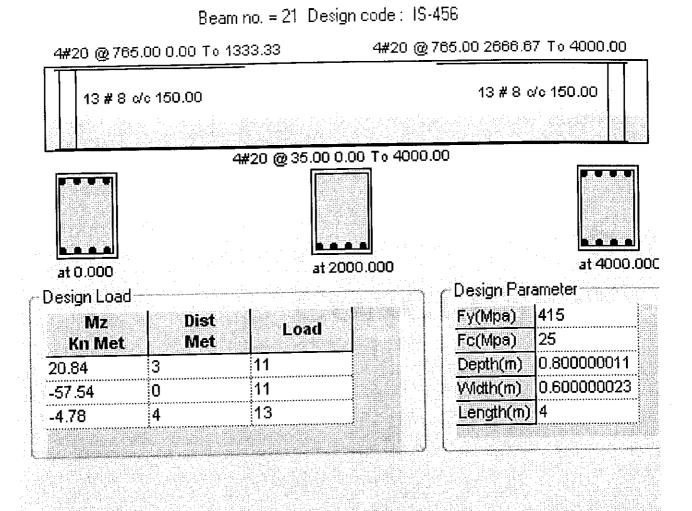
Detailing of the beams for the 4th, 5th and 6th storey in the above multi-storey building
